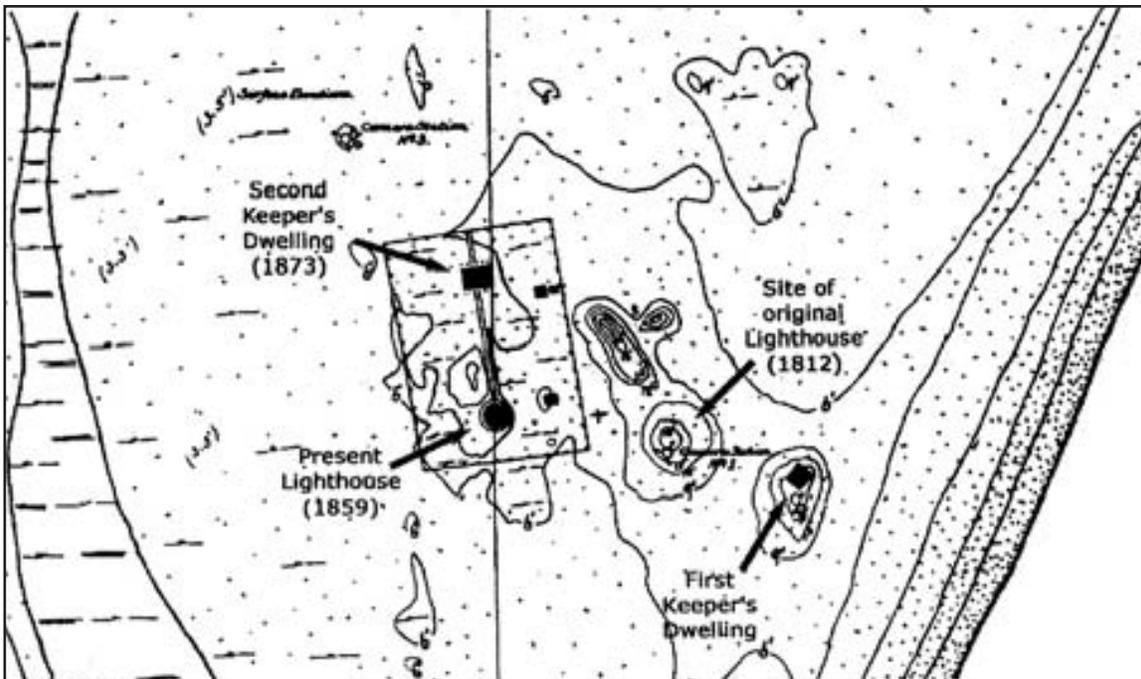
1906 plan of lighthouse precinct illustrating the perimeter fence.
